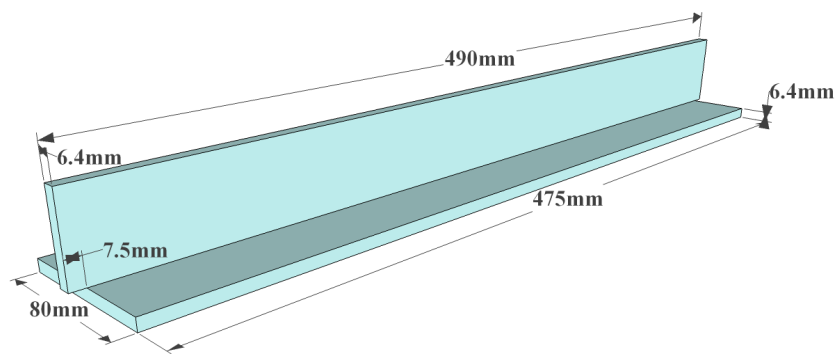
Vertical GFRP pultruded section stiffener used in specimen B8
